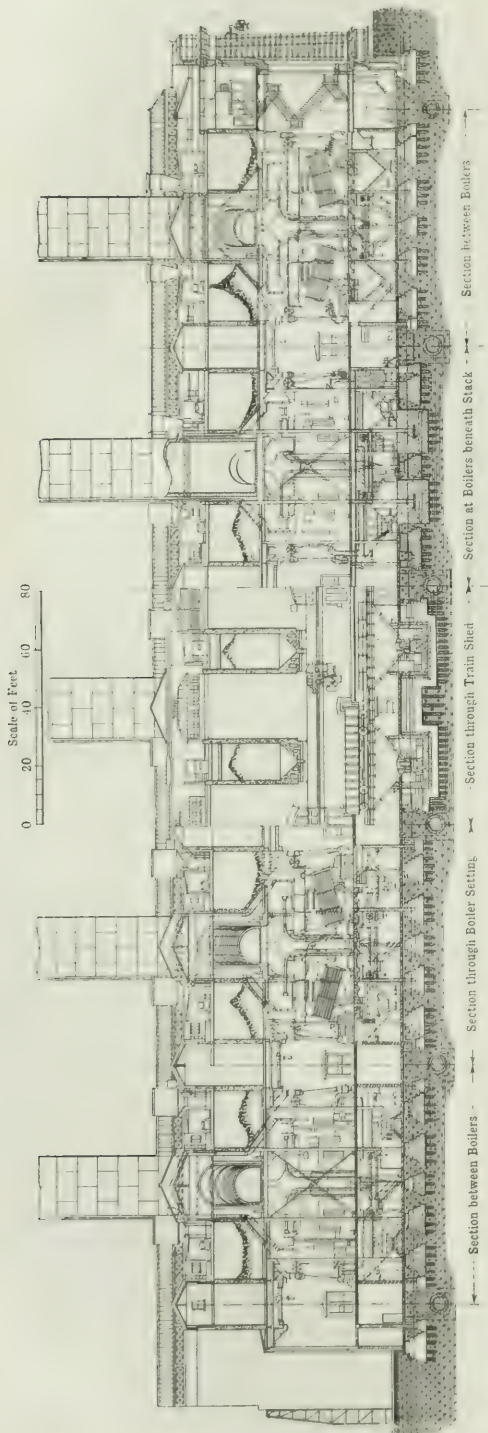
LONGITUDINAL SECTIONAL ELEVATION THROUGH BOILER ROOM OF FISK-STREET STATION, LOOKING WEST.
